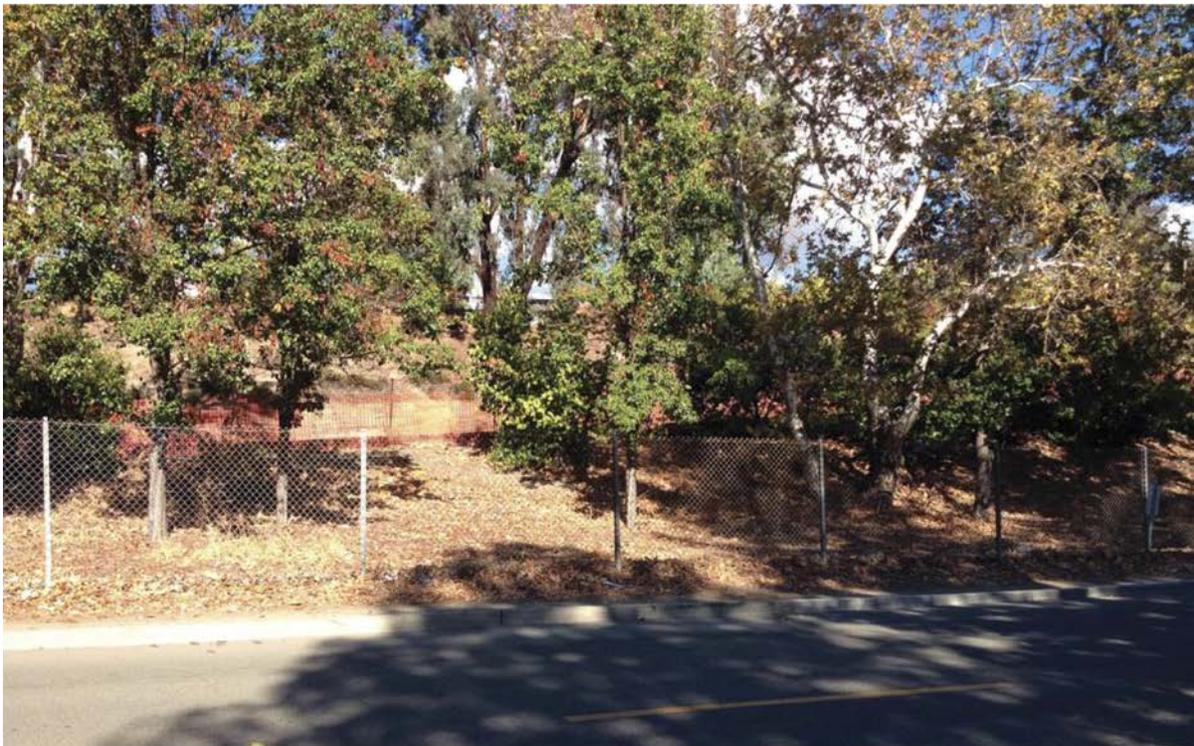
View of looking east from W. El Pintado Road at the elevated terrain along Interstate 680.
